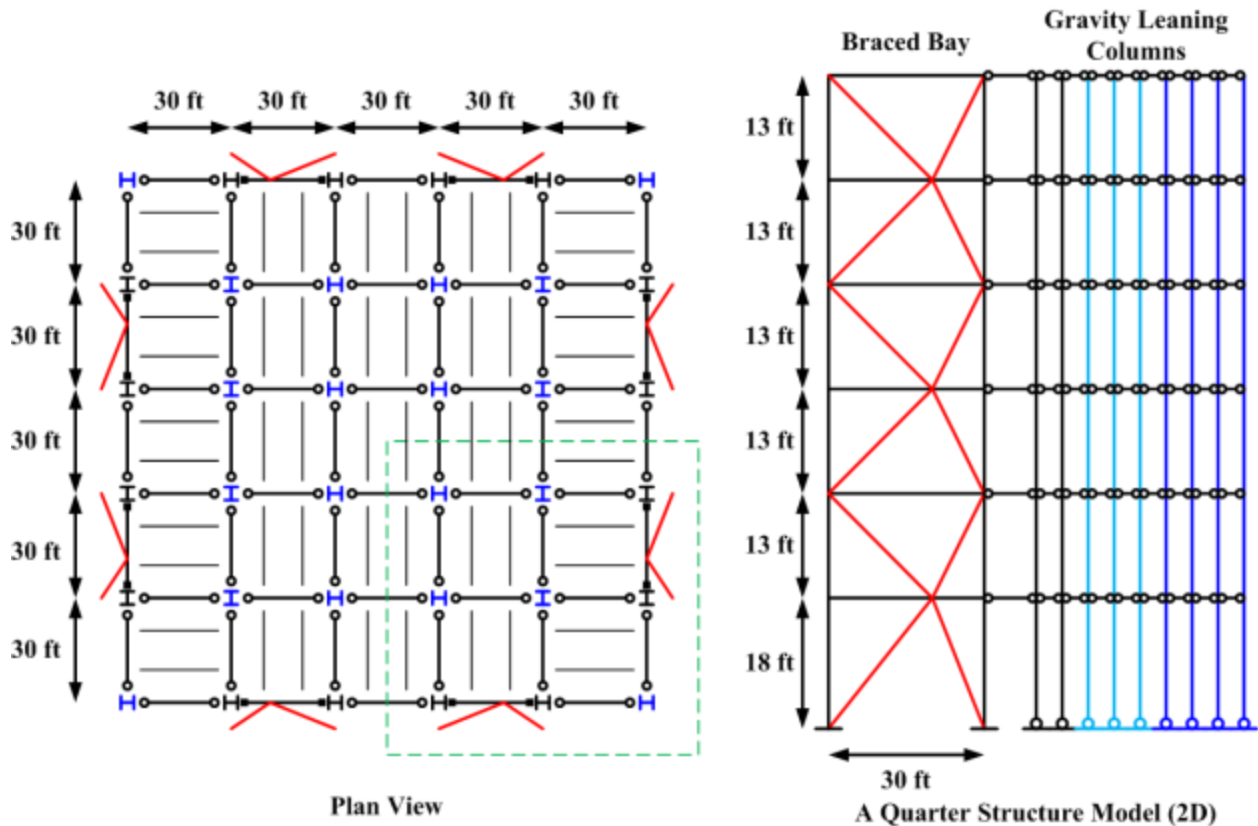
Plan view of the example building and the two-dimensional model elevation
